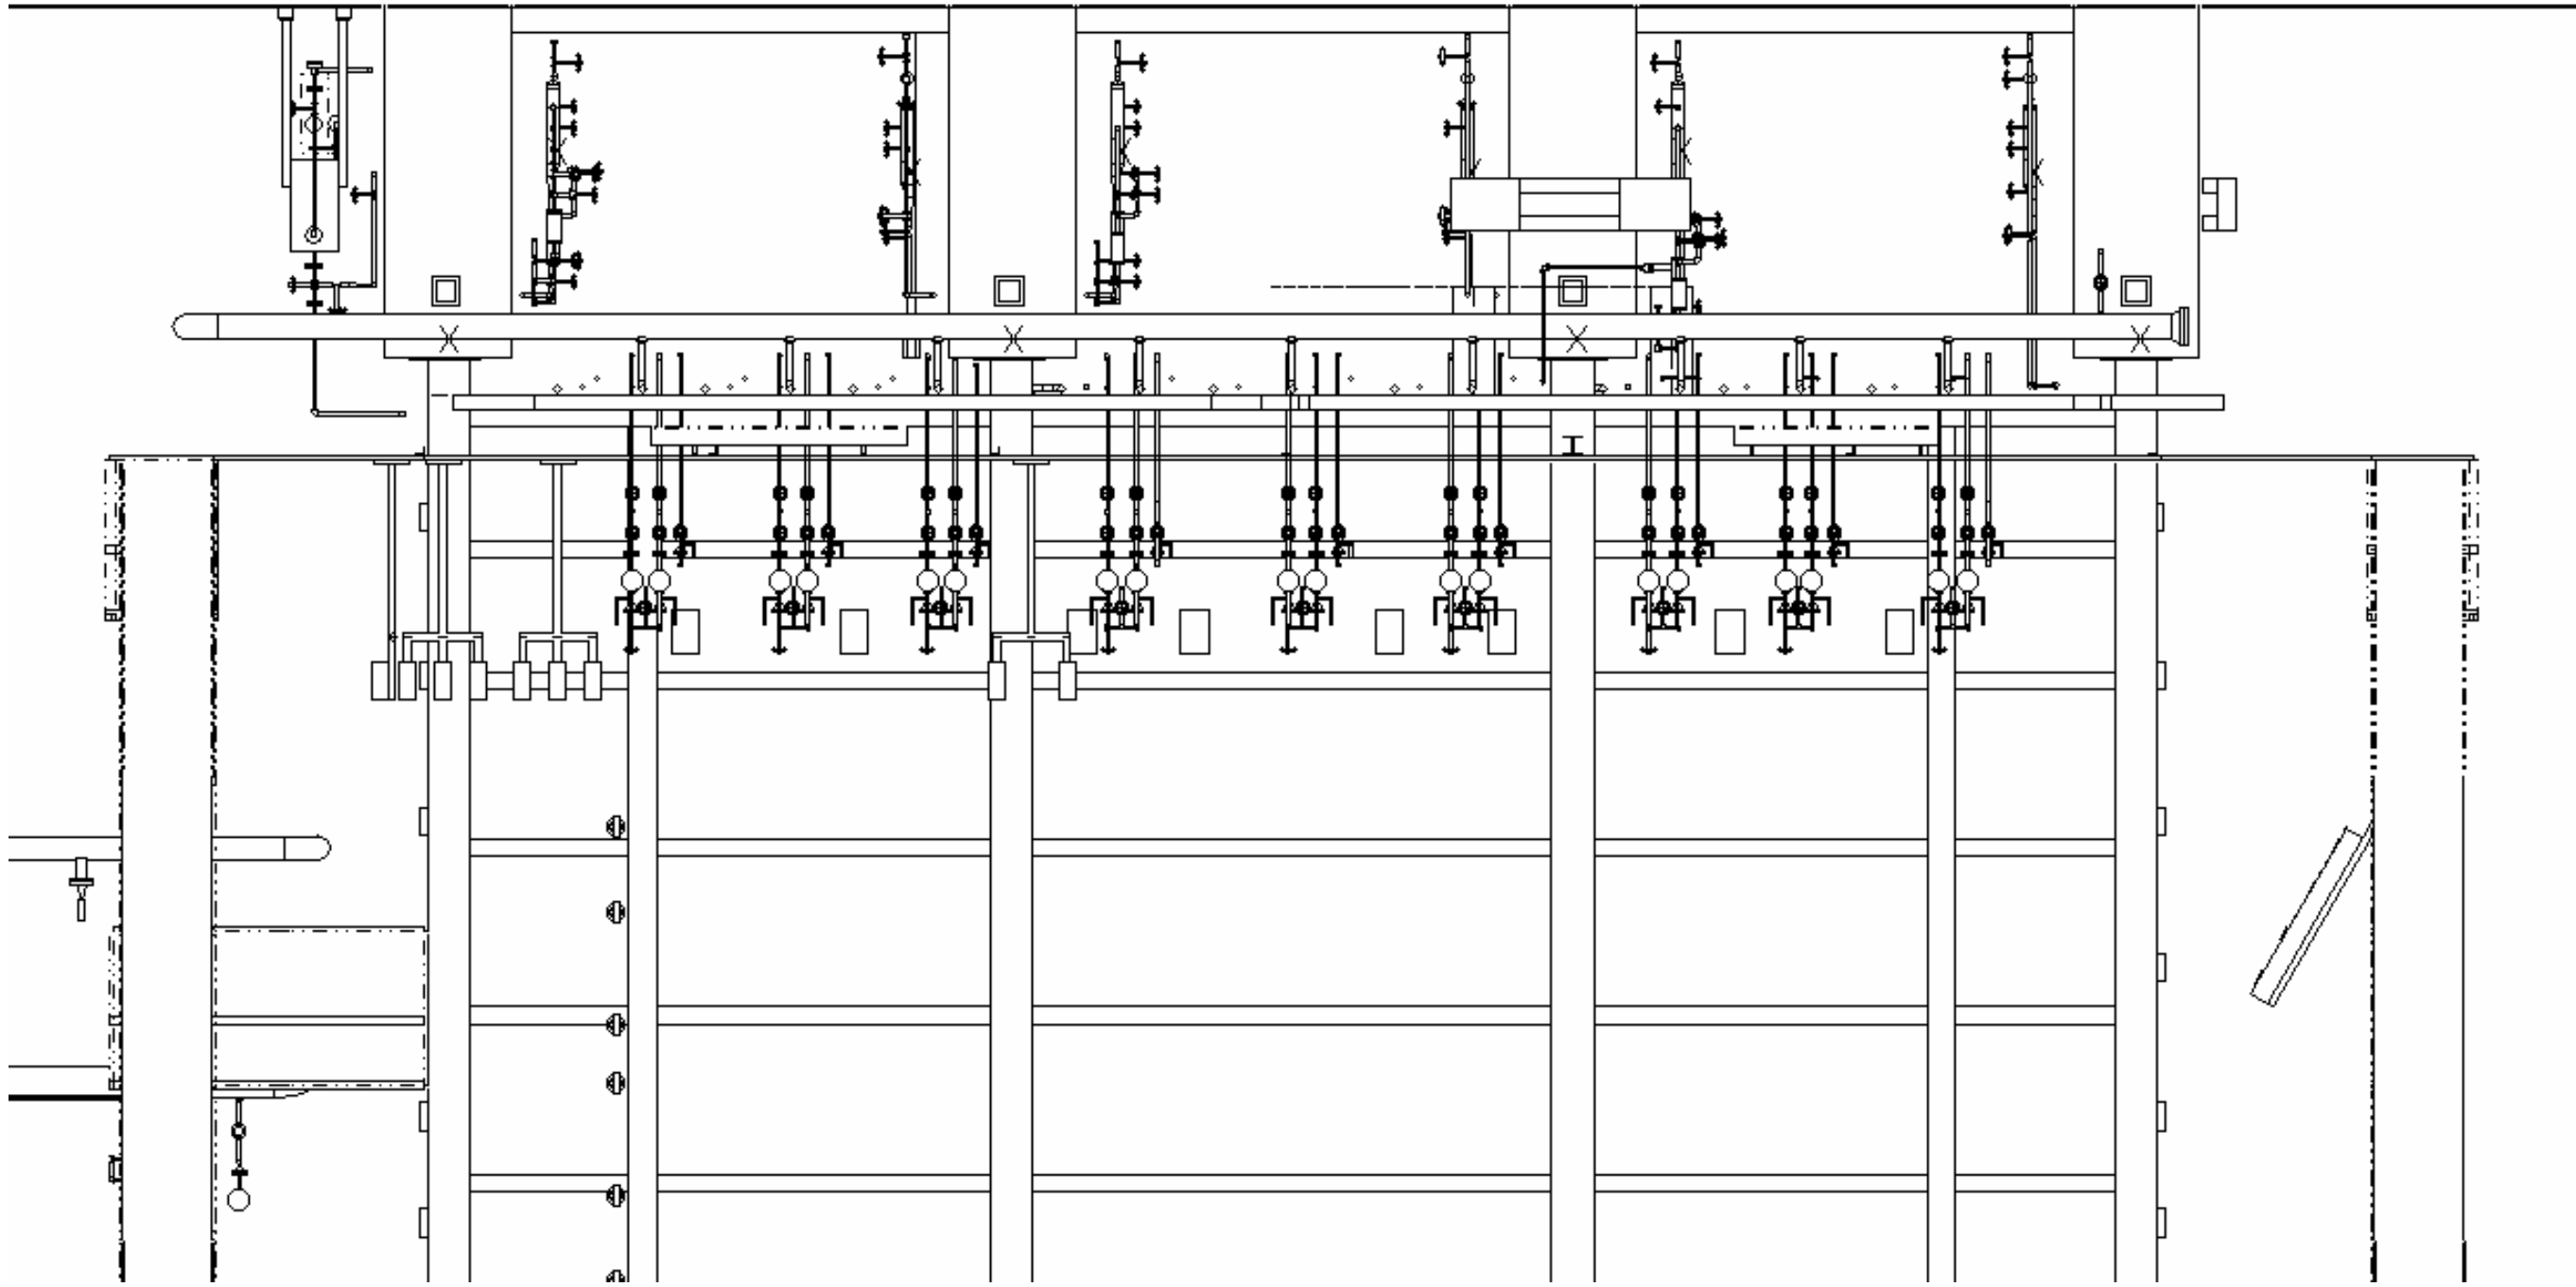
Example of typical installations of piping around box heaters
